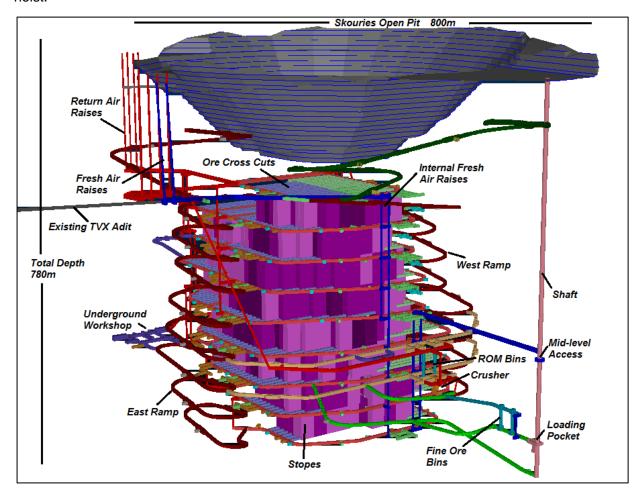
View looking South of General Access and Development Infrastructure for Phase 2
